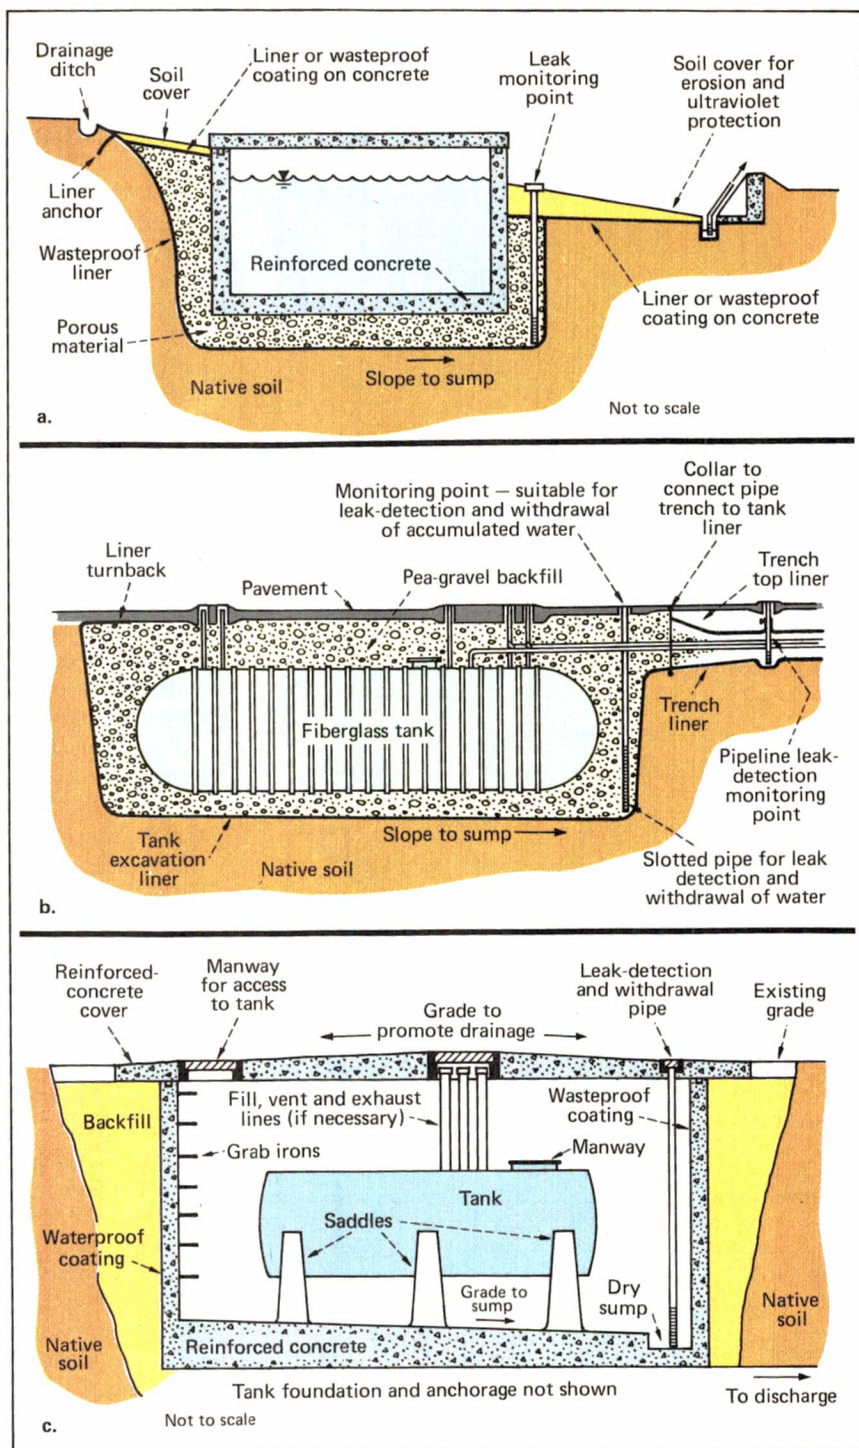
Some ways in which new tanks may have to be designed, or old ones modified, in order to meet the new underground storage-tank standards
